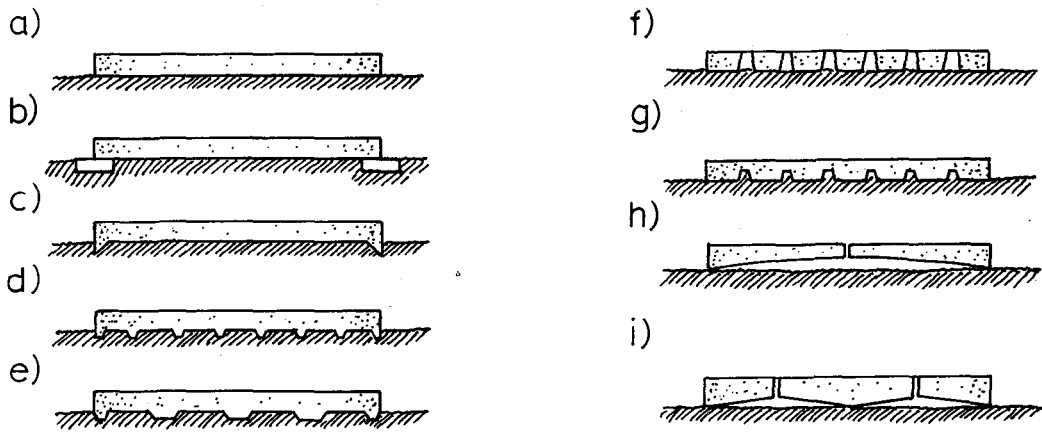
TYPICAL SLAB CROSS-SECTIONS
